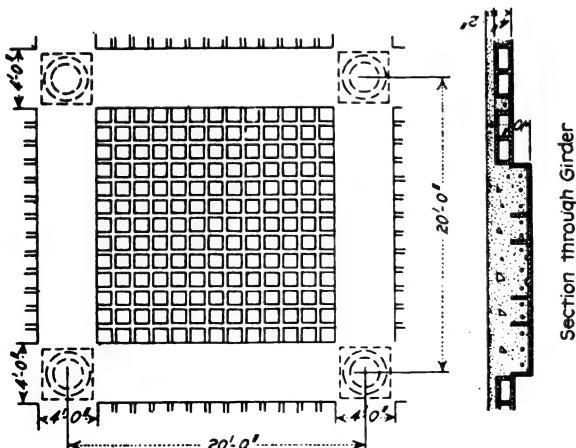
Corr-tile floor applied to wide girder system of reinforced-concrete framing.
